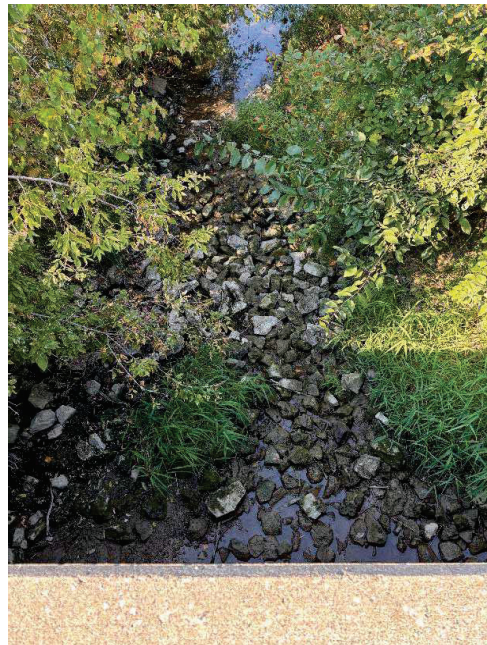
Channel of Crossing 9, north of County Road 46. Significant barrier to upstream fish movements.
